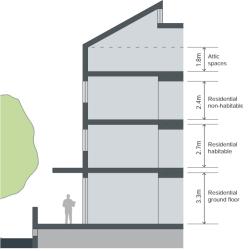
C.2 Ceiling heights of minimum 2.7m help to achieve good daylight access and natural ventilation to residential apartments
